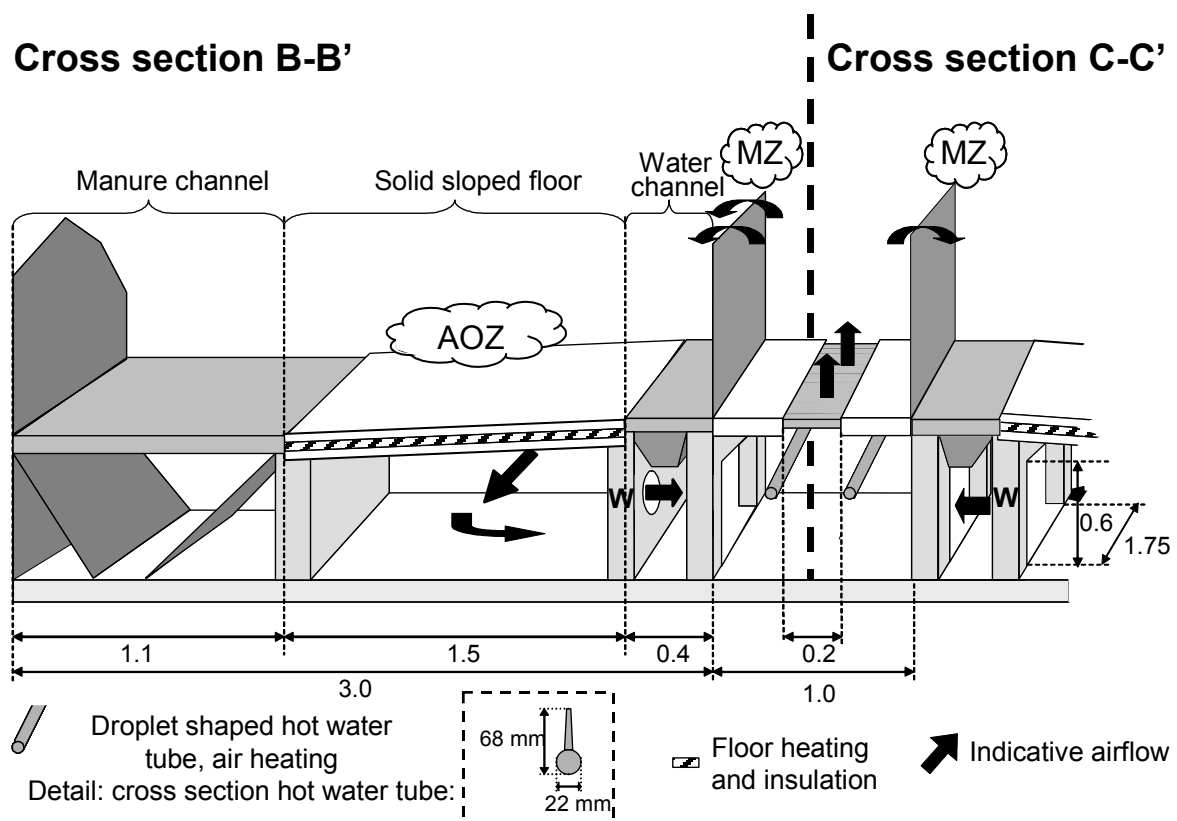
Cross-sections B-B' and C-C' of the ground channel (fig. 1) showing the animal-occupied zone (AOZ) and mixing zone (MZ) where sensors were located. The detail cross-section shows a heating tube. All dimensions in m (not to scale).
